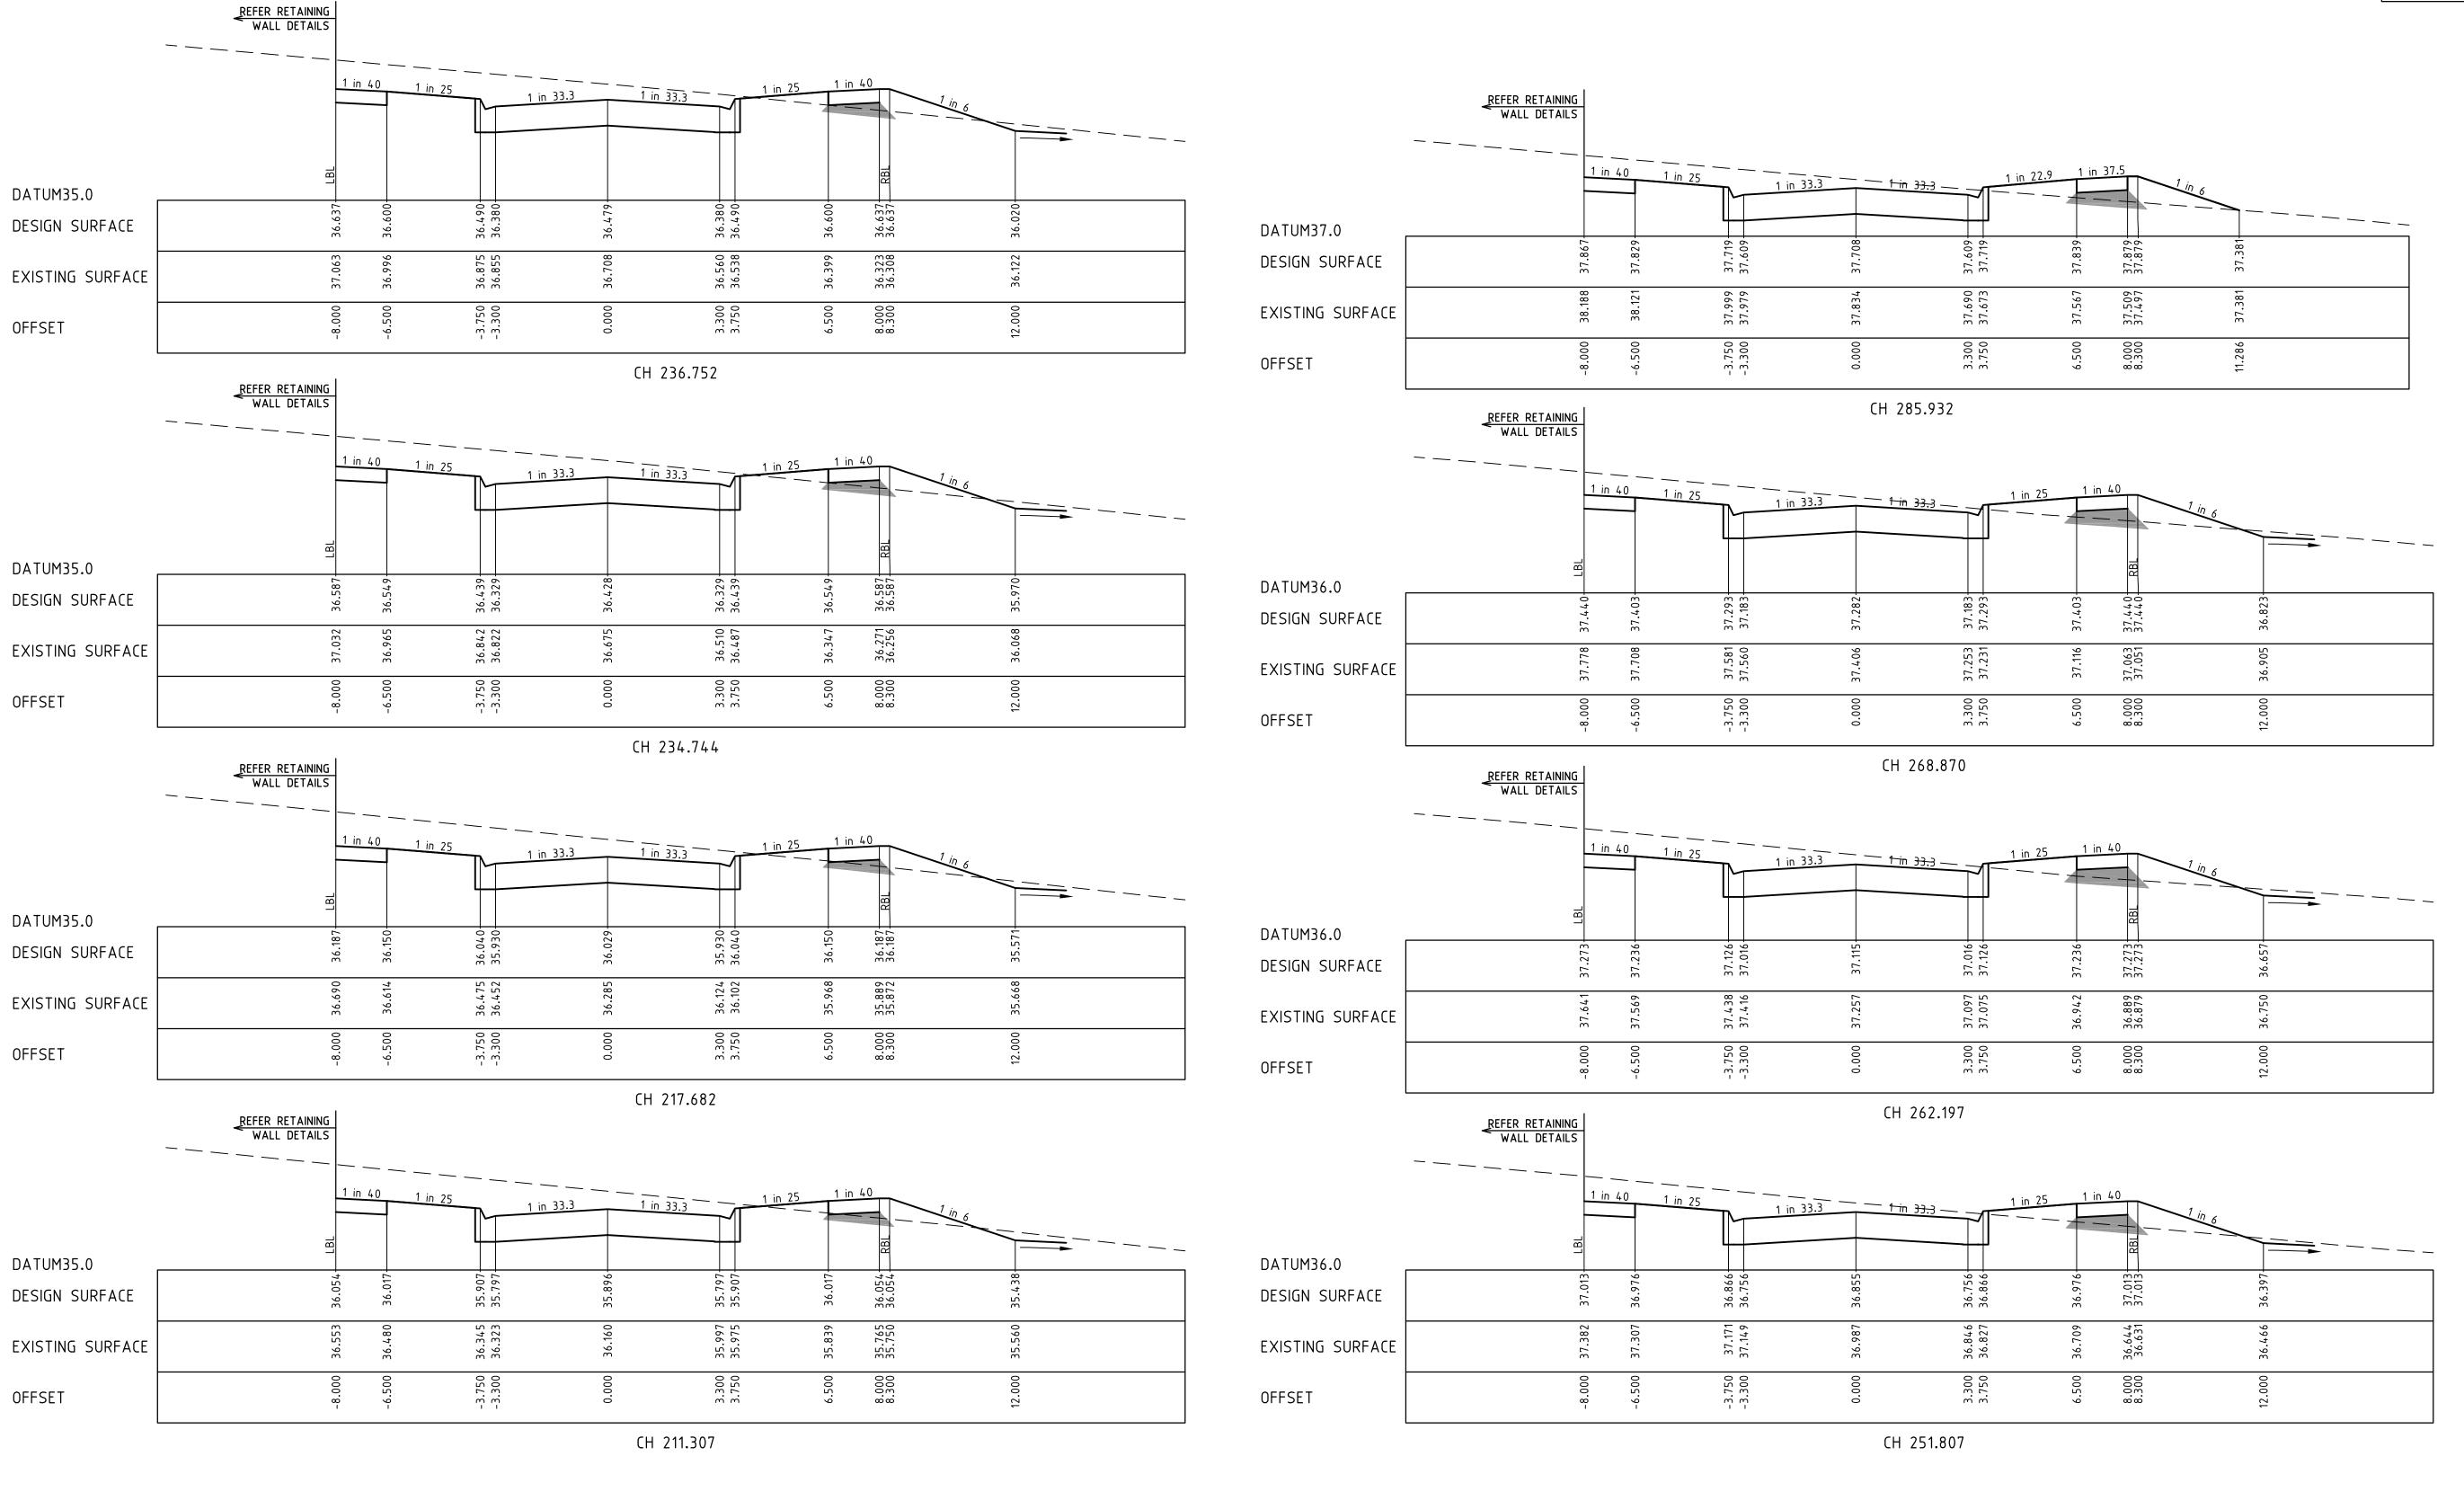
EHL-13C-08 Sheet No. 8 of 18
